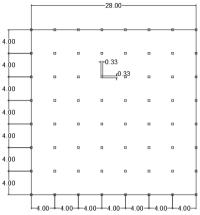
(a). Configuration of columns of 0.33m X0.33m in plan(dimensions are in m)
